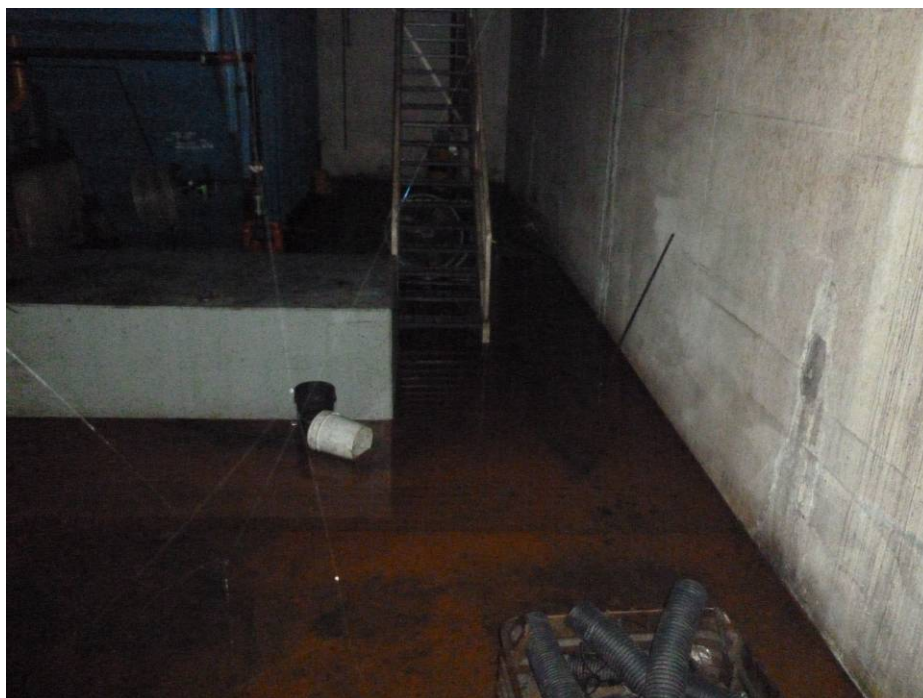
(AOI-02) South Gallery, east side. Oily residue on block grinding equipment. Oily residue also observed on floor surrounding equipment.
